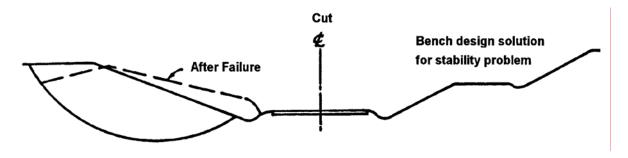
Deep seated slope failure (left) and bench slope design (right) to prevent slope failure.
